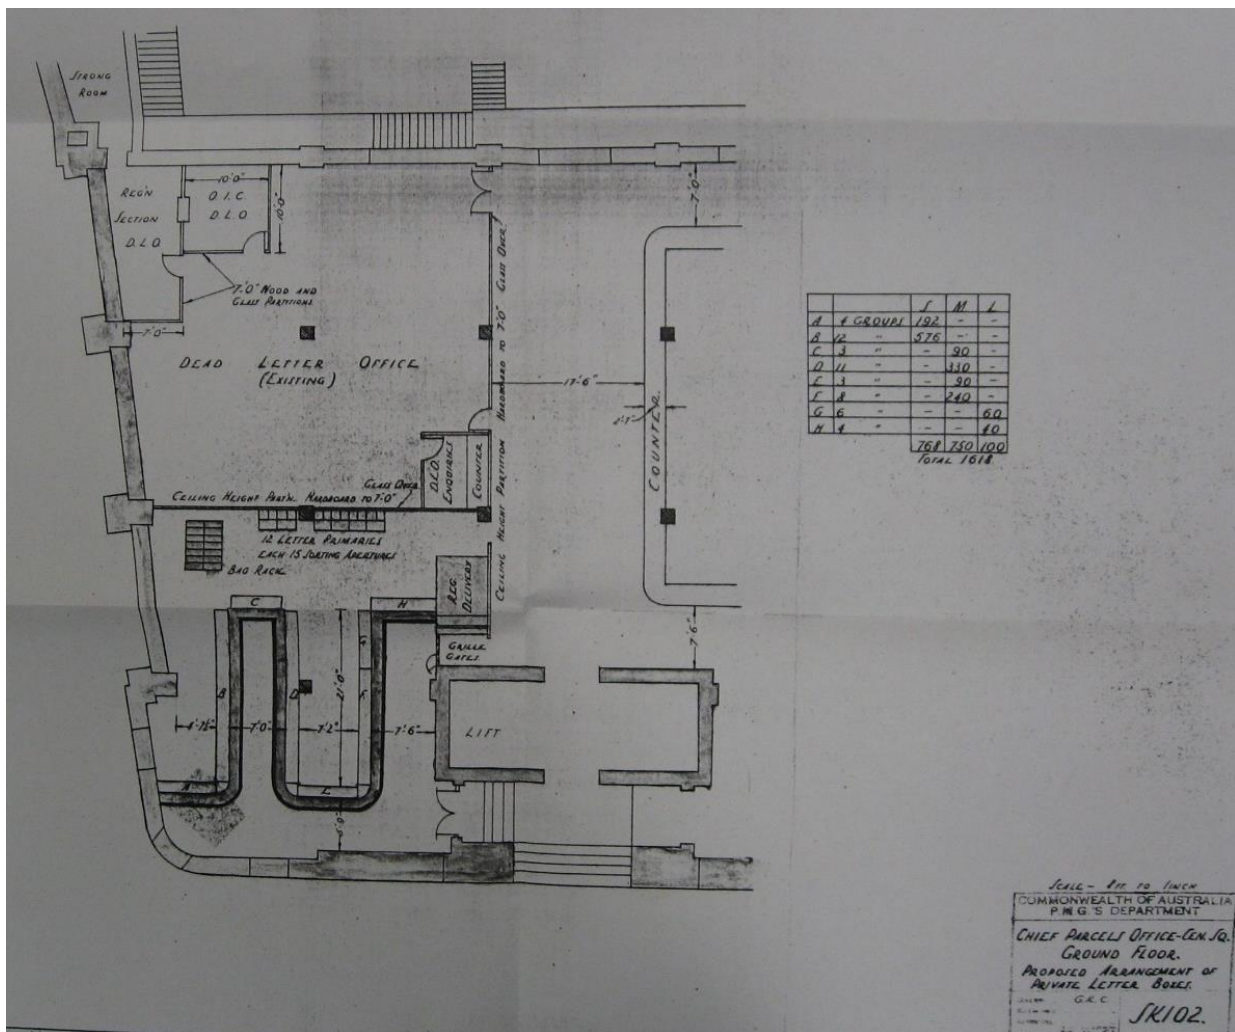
Chief Parcels Office – Central Square, ground floor. Proposed arrangement of private letter boxes, 1952
